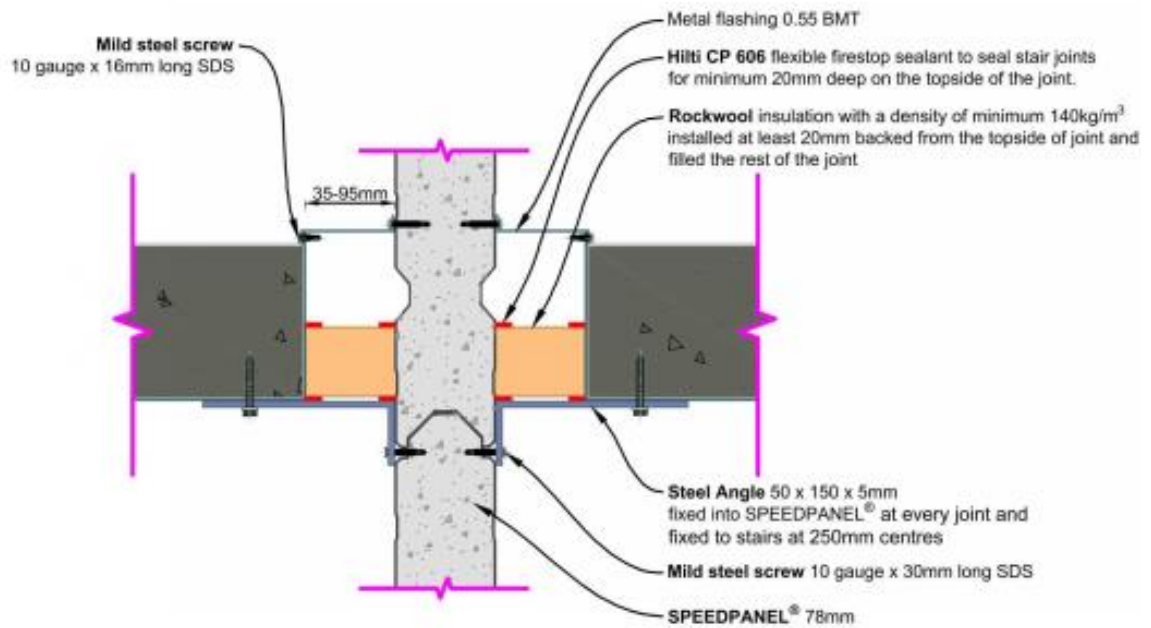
Wall-to-stair Joint (35-95 mm gap)
